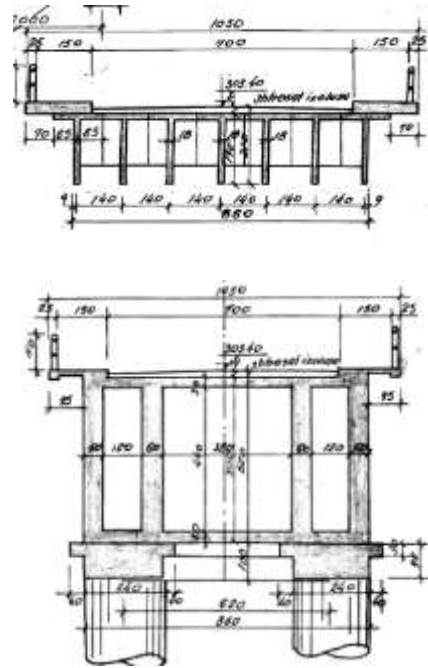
Cross Section bridge 1-1, 2-2 on middle and supported span length
